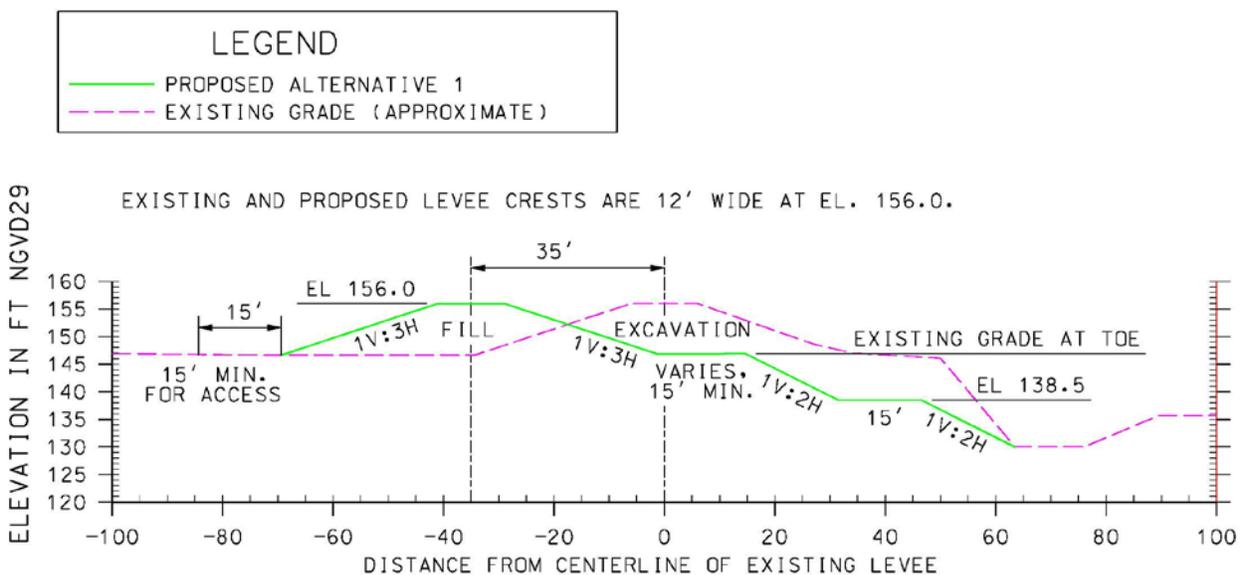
Typical Cross Section for the Selected Levee Repair Plan
